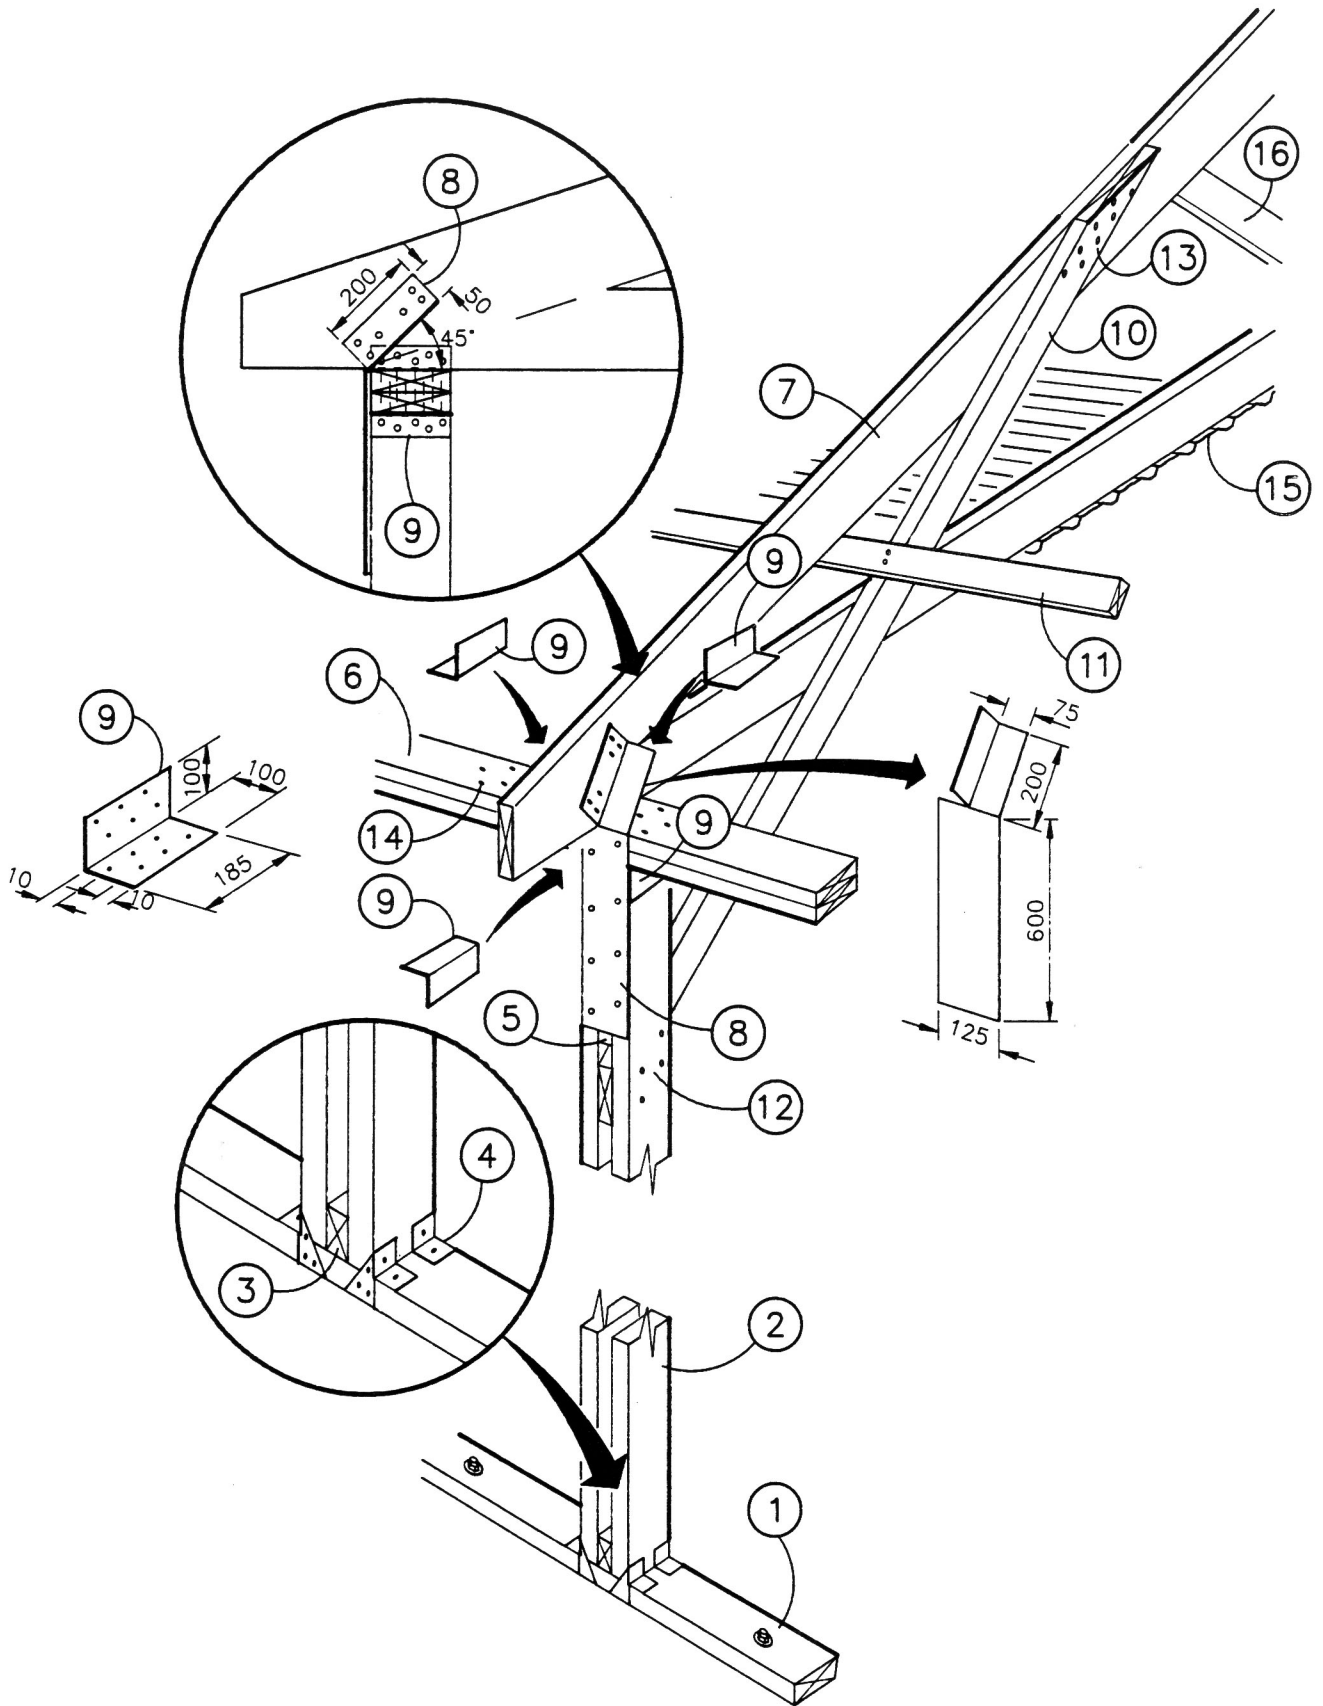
HEAVY DUTY KNEE-BRACES FOR STUD WALLS
